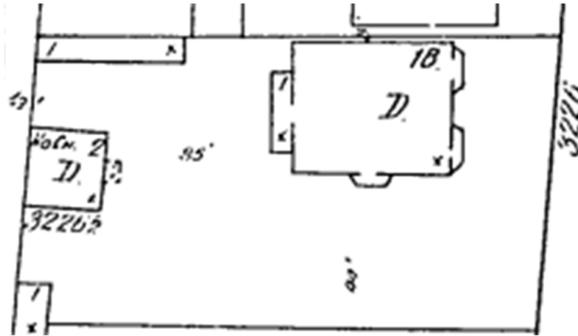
Site plans of 3226 King Street in 1911. North is up.
